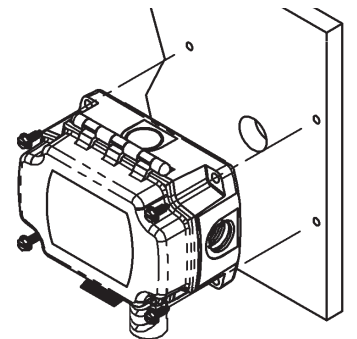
BAPI-Box enclosure mounting holes, rotate 90° for horizontal mount
